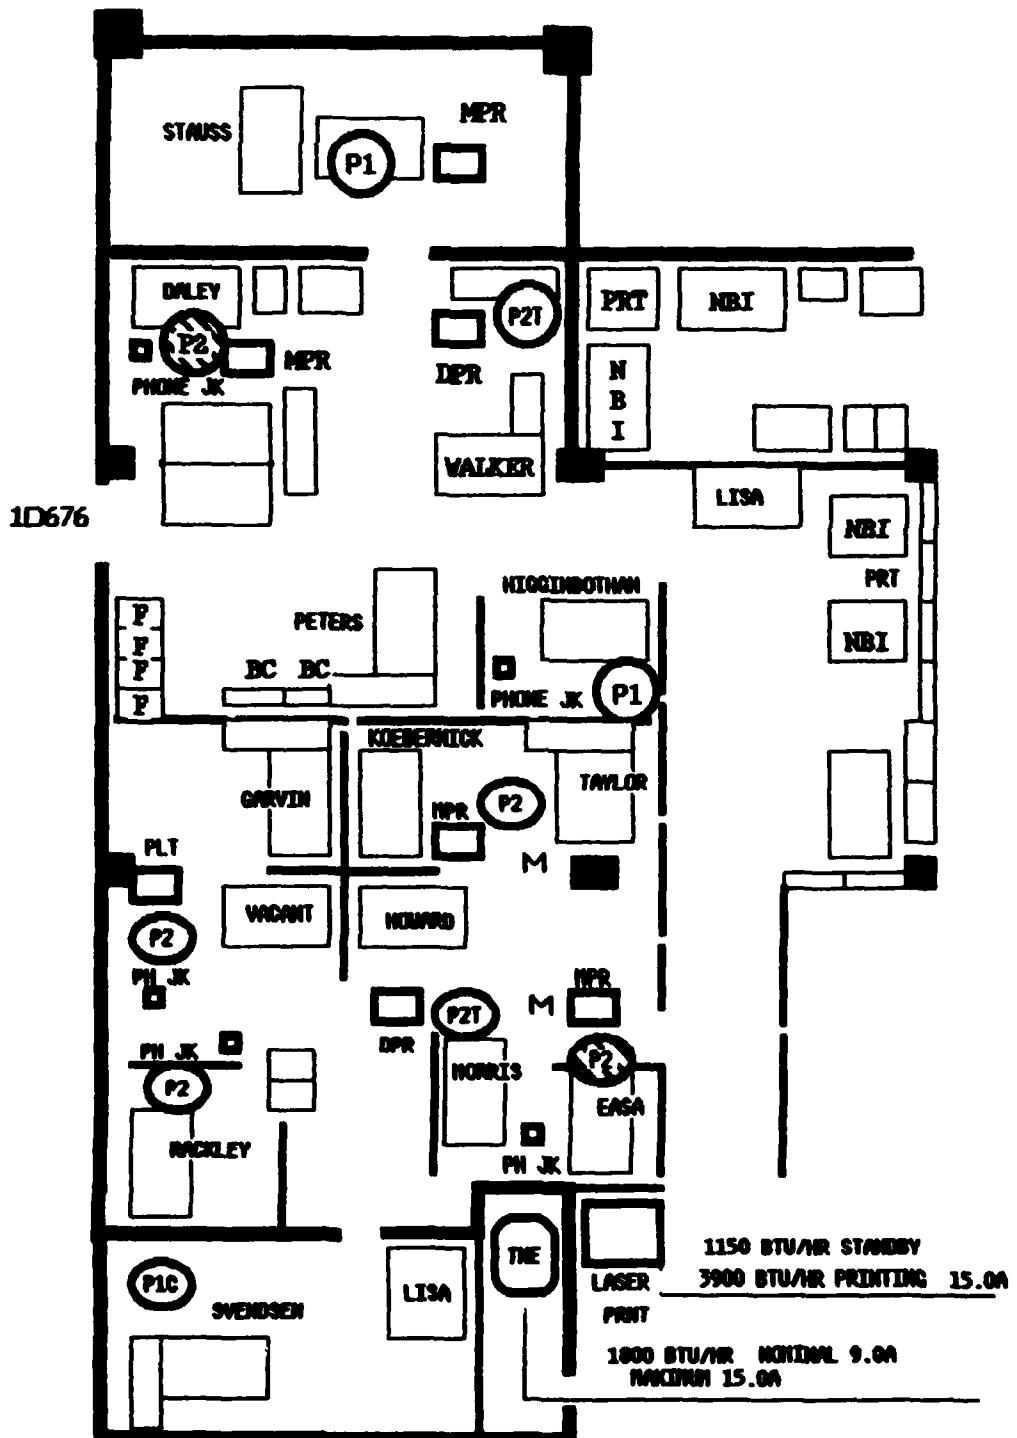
DAEN-ZCP-U/ZCR workstation layout.
